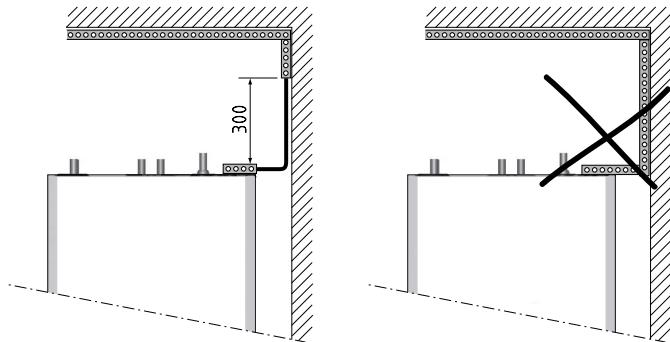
Recommended distance between trunking on the wall and trunking on the heat pump is 300 mm
